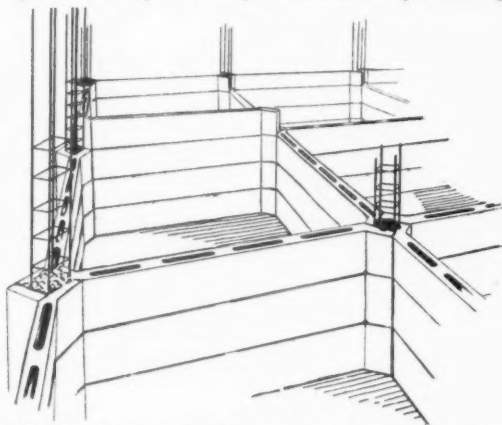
Square bins built up from pre-cast concrete sections. Note reinforcement at angles.
